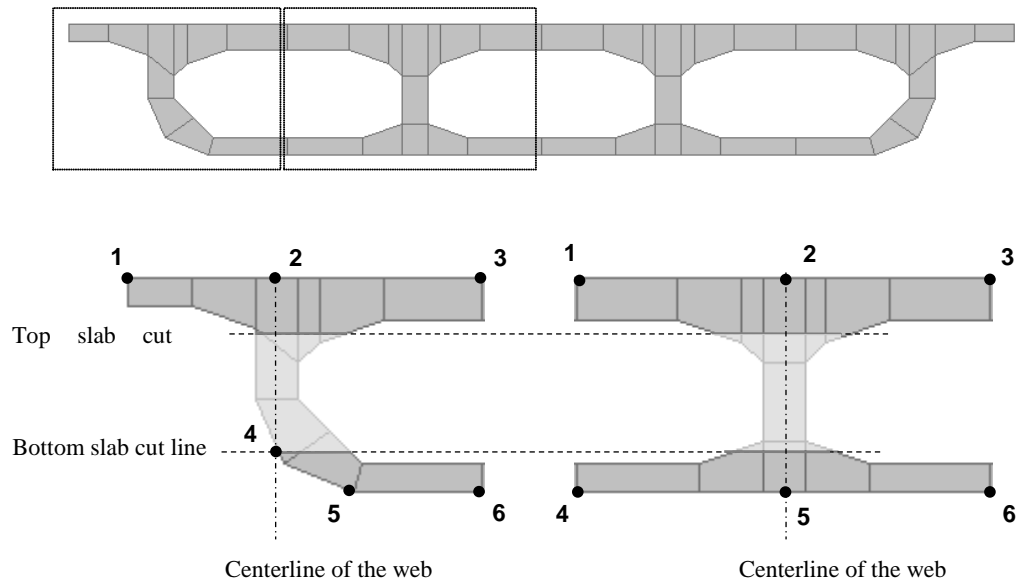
Bridge Concrete Box Deck Section - External Girders and Radius
